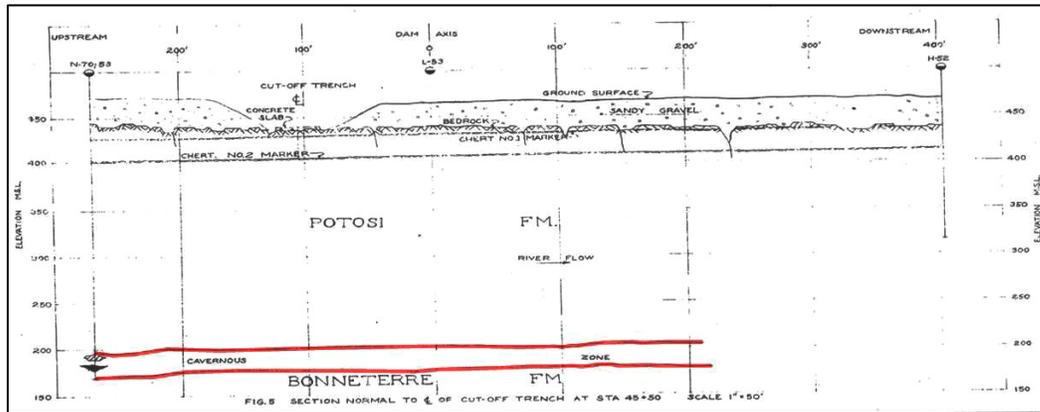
Cavernous Zone beneath Clearwater Dam (Source Foundation Report Cut-off Trench Section II Plate I-26, Sta. 45+50)
